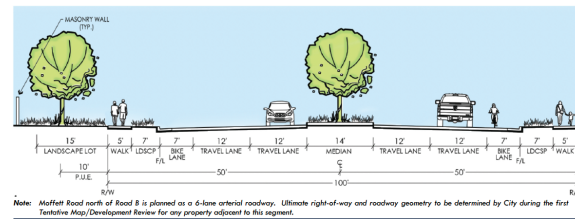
CENTRAL AVENUE & MOFFETT ROAD
